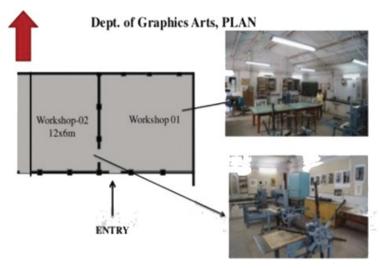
FLOOR PLAN FOR GRAPHIC ART
